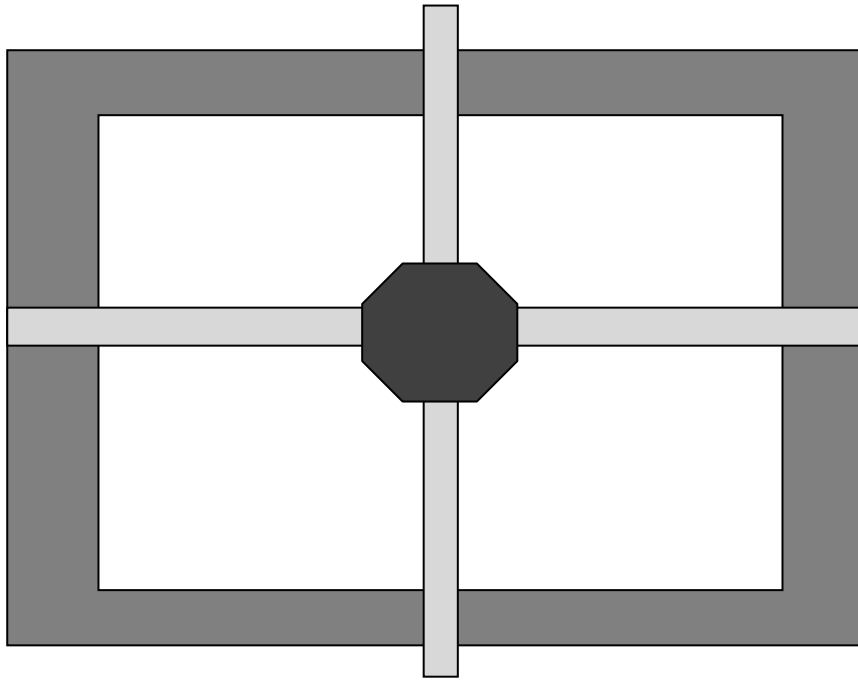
Richmond Lunatic Asylum c.1830 (Floor plan – not to scale)
